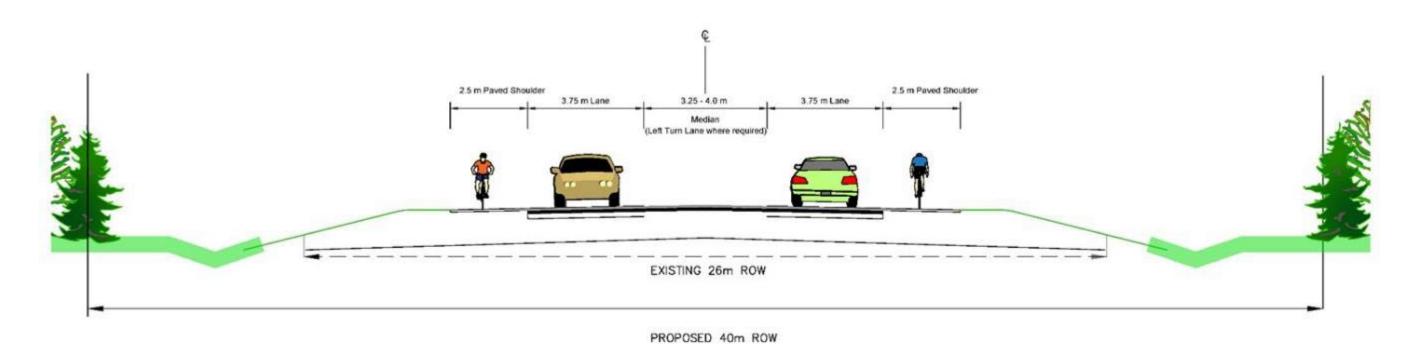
Section 3 Alternative 2 – 3-Lane Rural Cross Section
